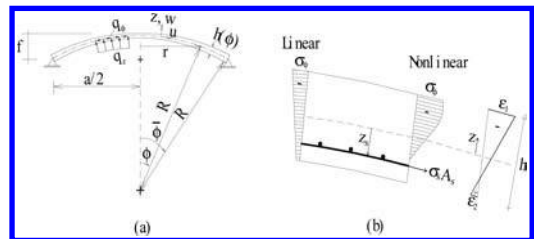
Axisymmetric shallow thin-walled concrete dome.
